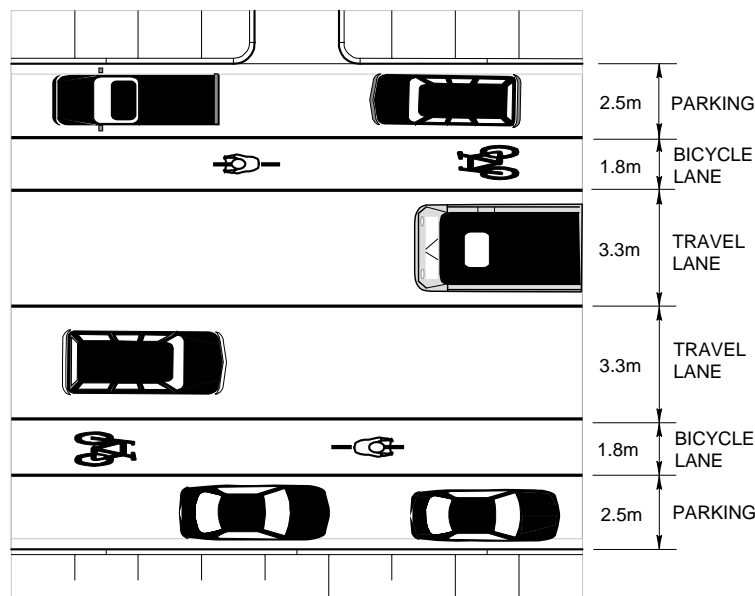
Dunbar Street Bike Lanes, W 16th Ave to W 41st Ave - Typical Configuration
